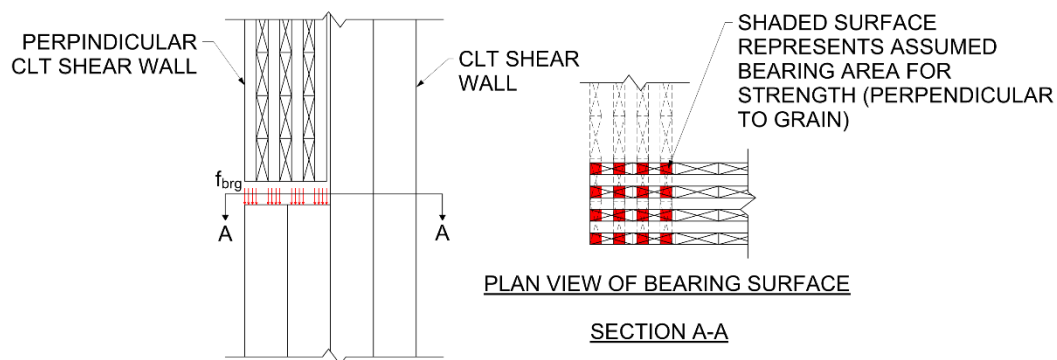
Bearing failure in 5-layer CLT floor panel
